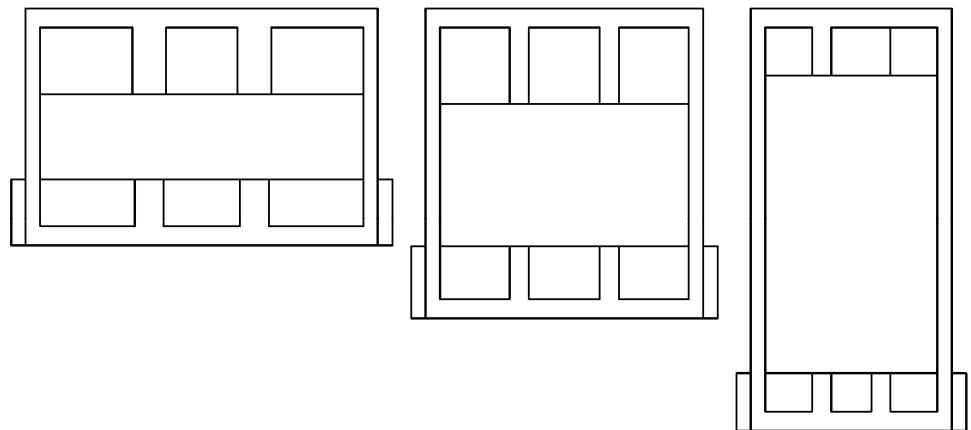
Cross sections of proposed designs for irreversible repository operated from ground level. Inside diameters are 33.8 m, 26.0 m and 18.0 m. See drawings no. 1-06 to no. 1-11 in Appendix C for possible cut-off structures.
